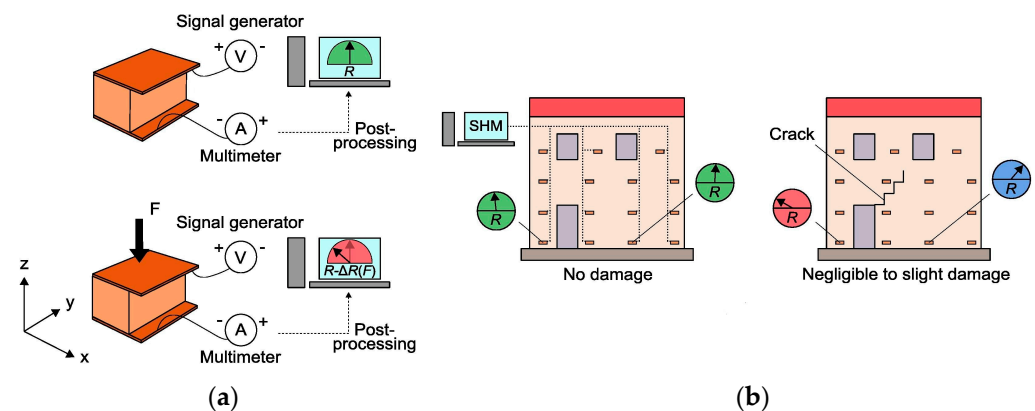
Concept of smart brick technology (a) and an example of its application for strain monitoring within a damaged masonry building using smart brick ((b), from [142]).
